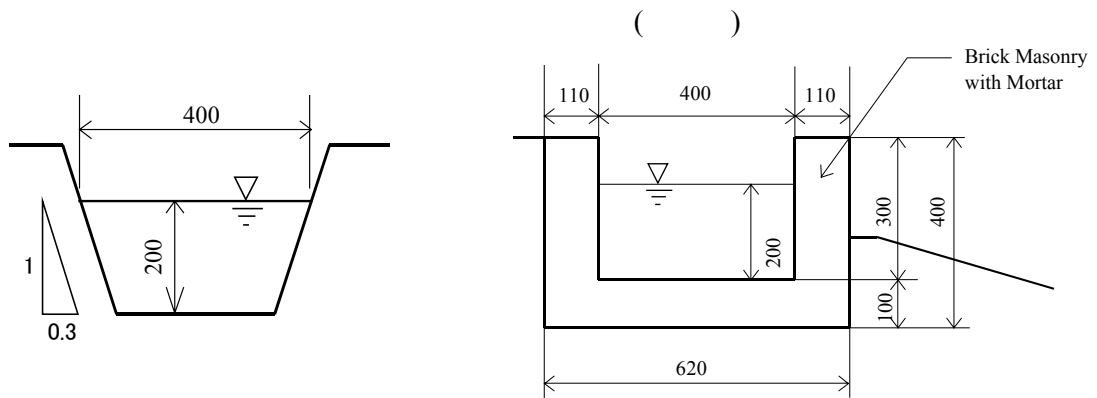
Cross section of no-lining channel (left) and brick masonry channel (right)
